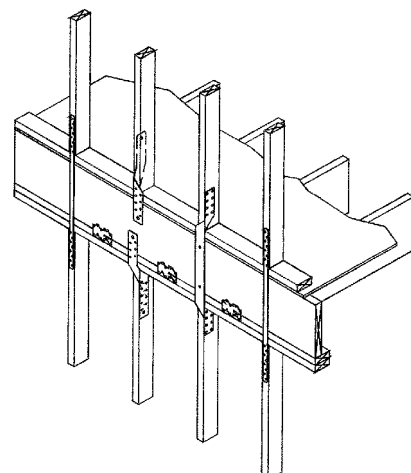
First to Second story hold-down installation examples. (adapted from SSTD10-99).
